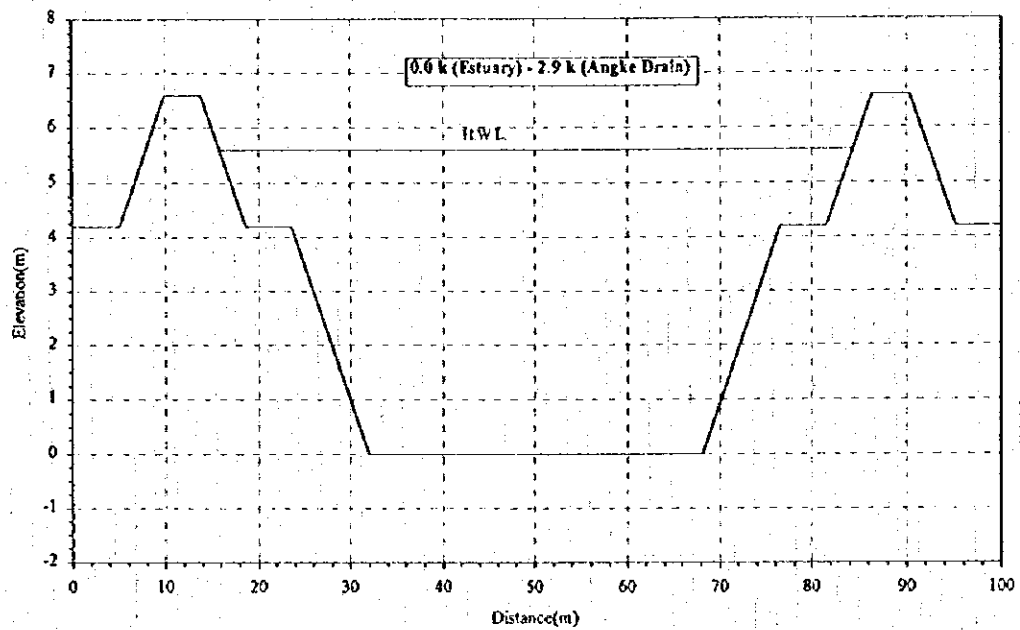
PROPOSED STANDARD CROSS SECTION OF WBC (1/2)
